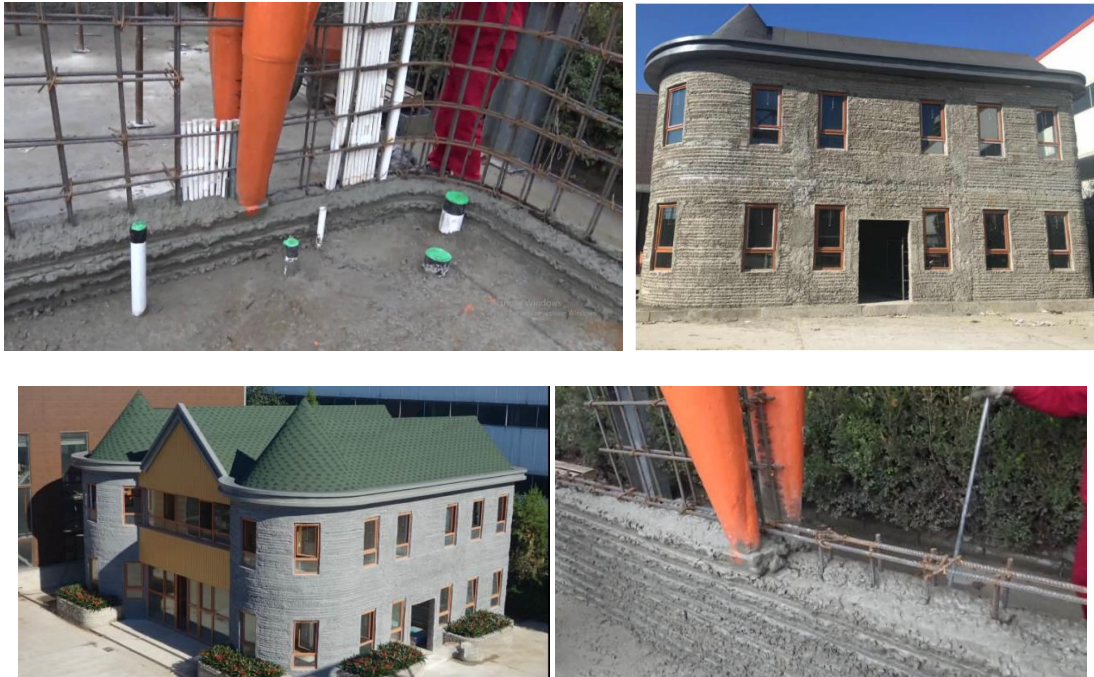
HueShang 3D printed house. (1) Nozzle encasing erected pipes with concrete, (2) structure finished showing the rough surface finish, (3) 3D printed reinforced concrete 2 story house, (4) nozzle encasing erected reinforcement in walls.
